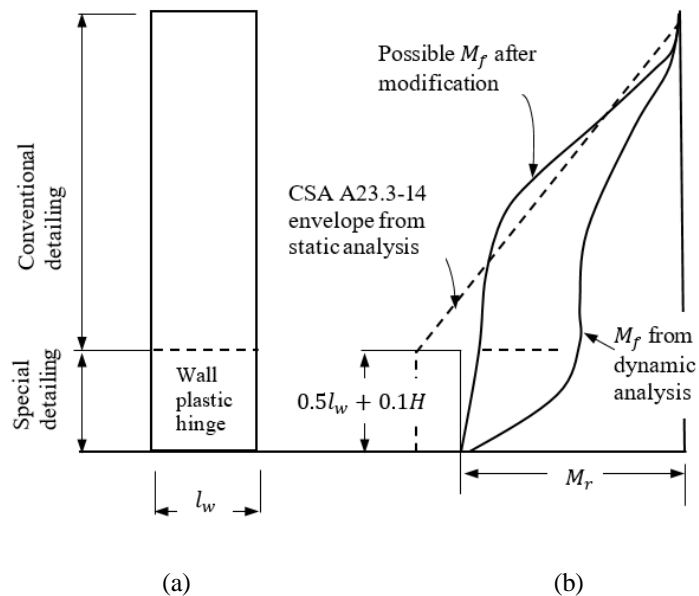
Capacity design moment envelope for RC wall: (a) detailing requirements; (b) variation of moments along wall height
